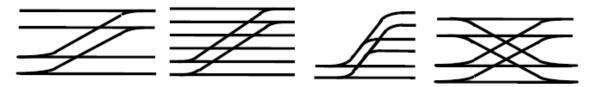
; Classic switches layouts such as escape, diagonal, haz and bretelle (ADIF 2008)
